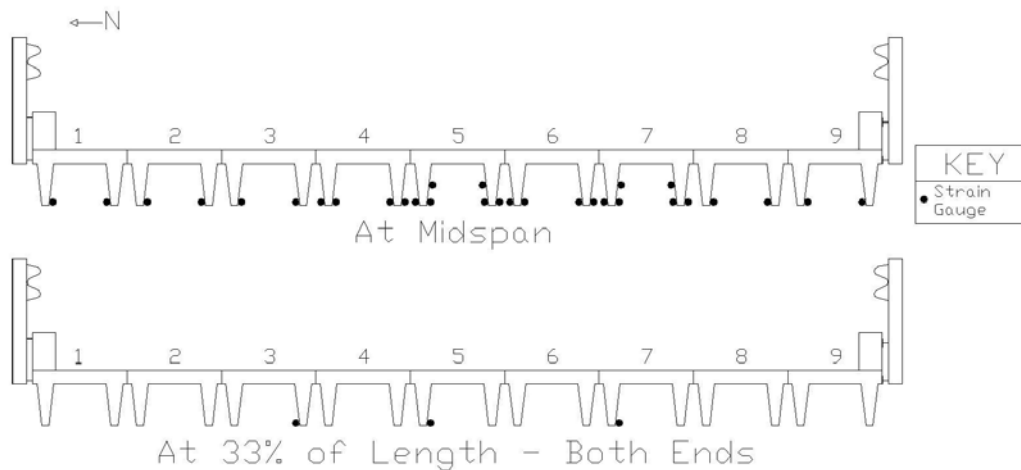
Instrumentation layout for proof load testing (Bridge 7701).
